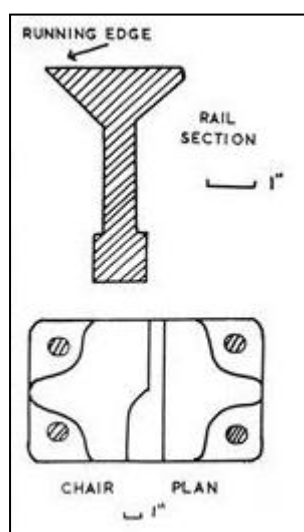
Plan of the chair and section of the rail uncovered on the incline in 1956 (Hall 1961, 226)
